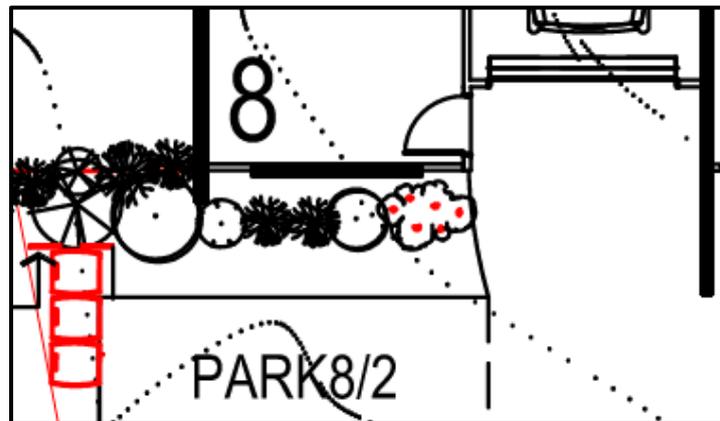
Unit 8 site plan for 21 Coleman Street, Moonah.
